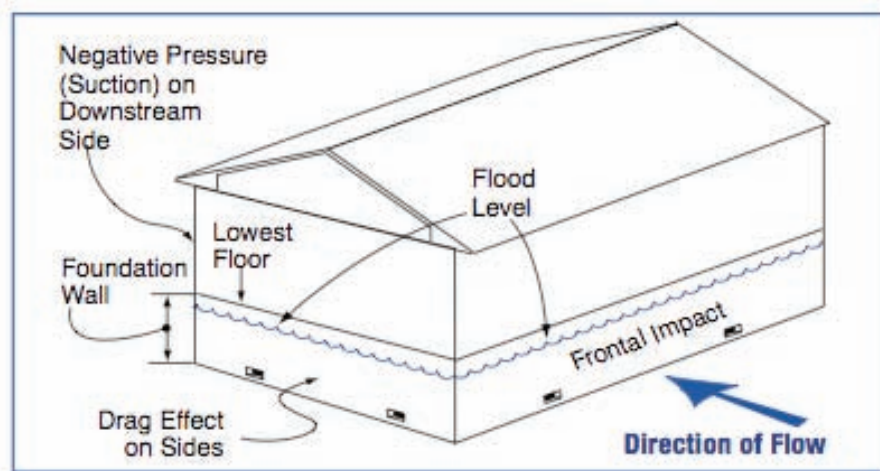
Hydrodynamic loads on buildings (From FEMA. 2000. *Coastal Construction Manual*, FEMA 55).
